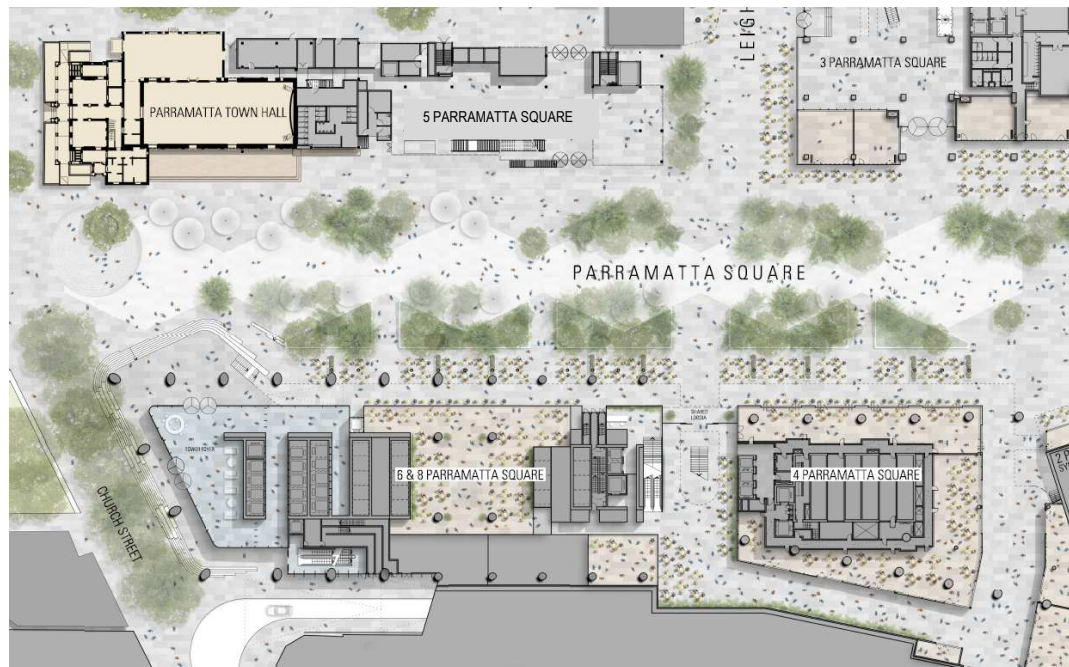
Subject site in the context of Parramatta Square developments (Source: DA Plans for Tower)
